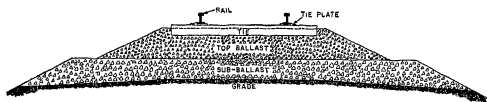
TYPICAL SECTION OF RAILROAD ROADBED AND TRACK
